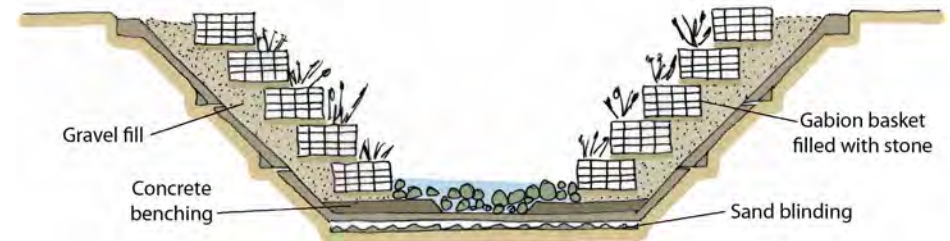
A retro-fitted bio-engineered wall uses gabion baskets to accommodate fauna and flora. (Author, 2013. Adapted from PUB, 2009)
